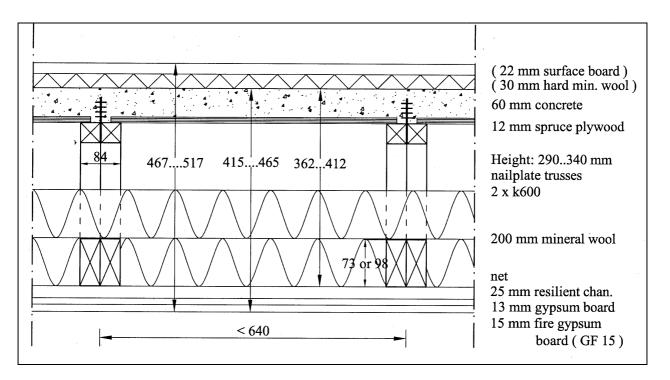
Cross section of the in situ casted wood-concrete composite floor (multi-storey house case).
